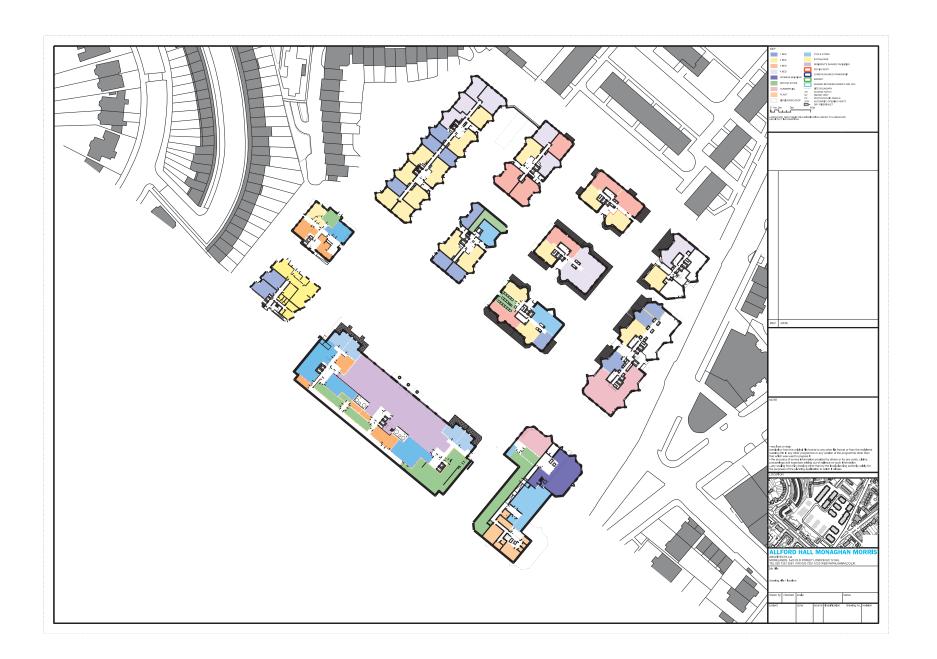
First Floor Masterplan (AHMM project 17105, dwg. 119, rev. P01, Oct 2021)
